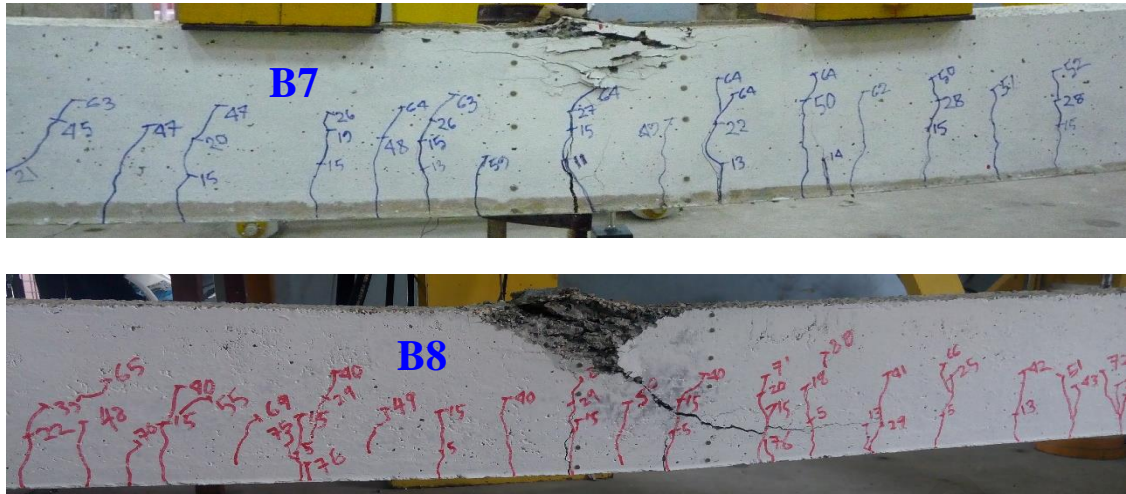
Typical flexural failure of the Beam specimen (B7 to B8)
